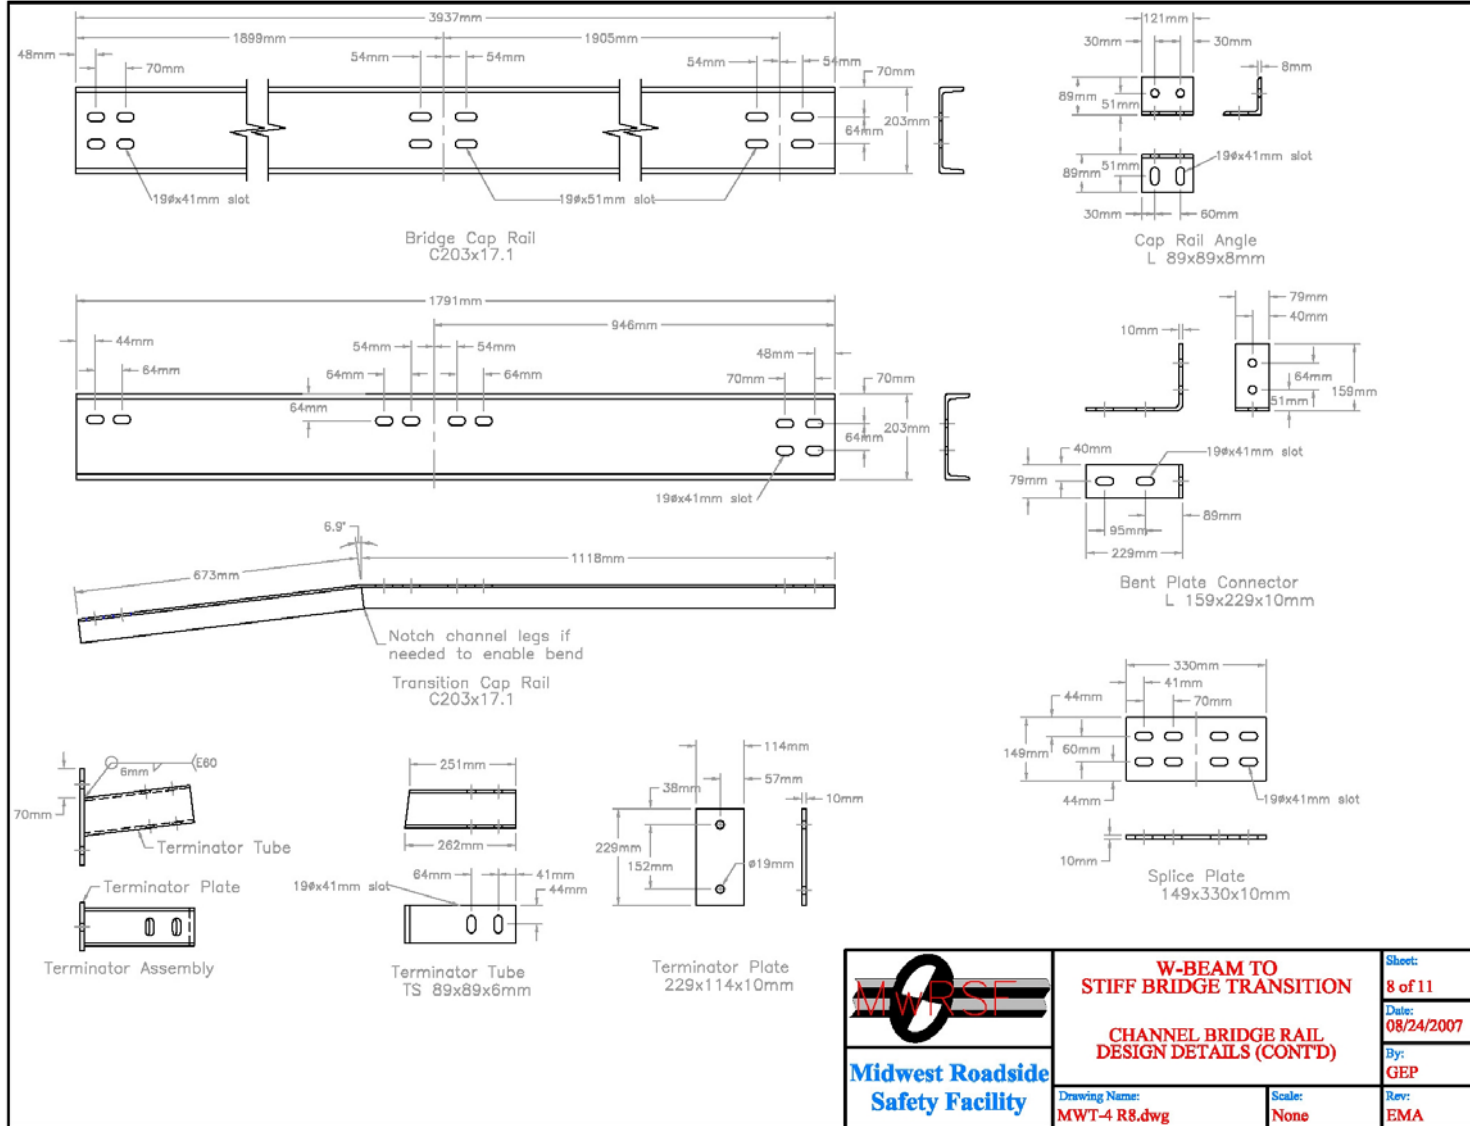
Channel Bridge Rail Design Details (Design No. 2)
